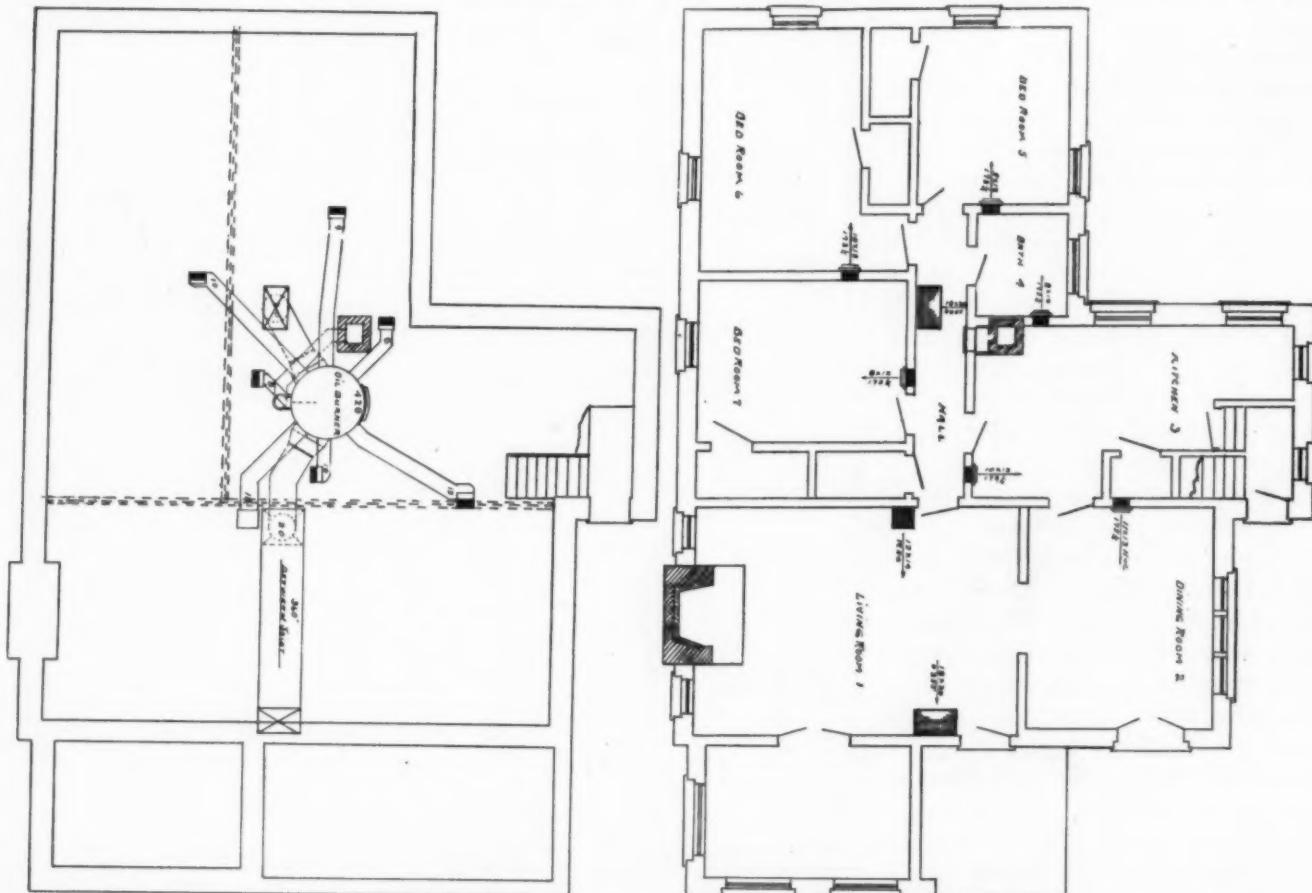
Basement and Floor Plan of K. B. Donnell Residence, Rochester, New York, Installation Being Made by William H. Long
